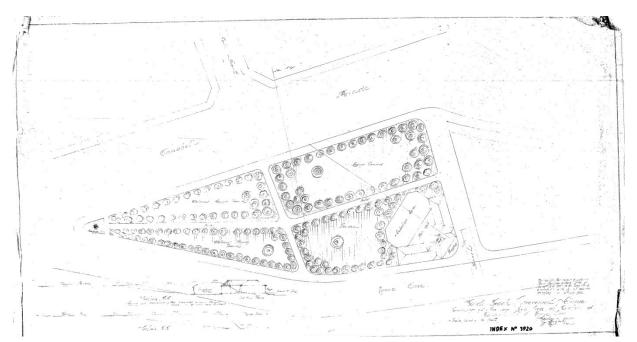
1928 design by Robertson and Marks for the park and surf club building in the area of the tram loop. There are sections at the bottom of the drawing that show the profile of the former tram loop. Source: WLS Engineers Plans 0003920-01
